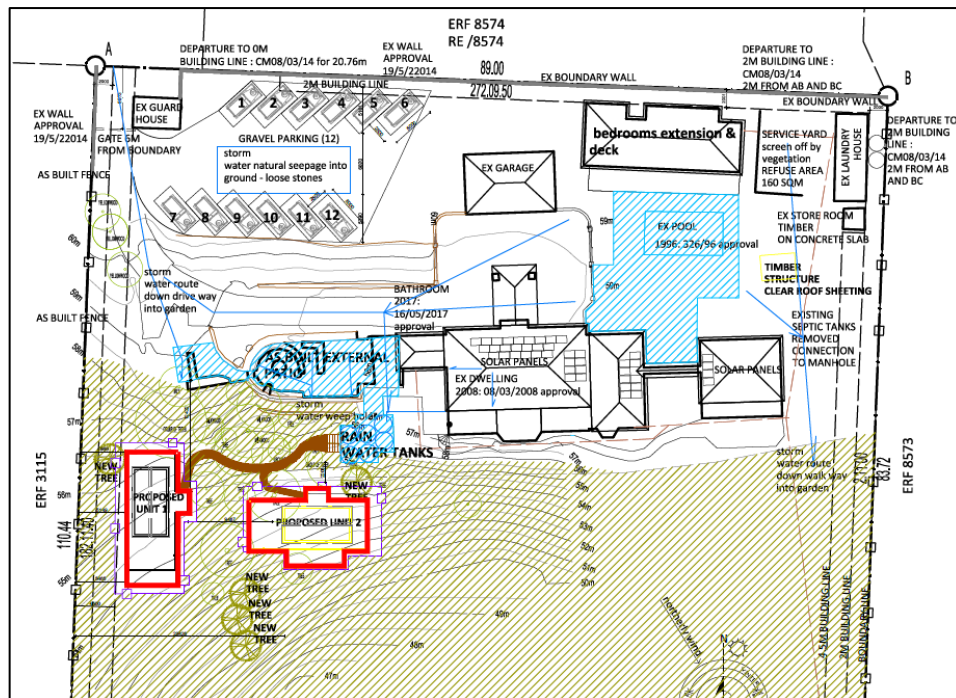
PROPOSED SITE DEVELOPMENT PLAN
